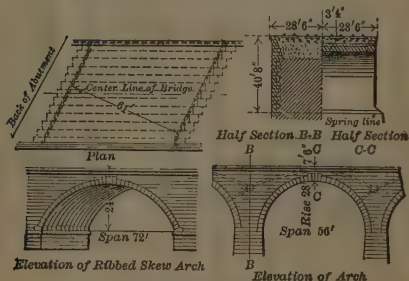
Railroad Bridge, New Brunswick, N. J.
